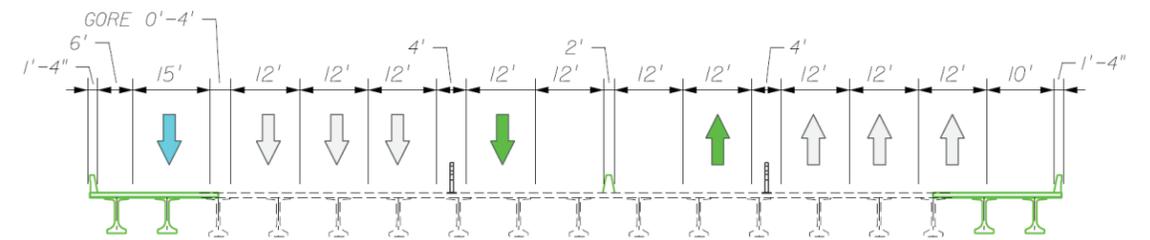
Proposed Bridge Over SW 56th Street/Miller Drive Typical Section
